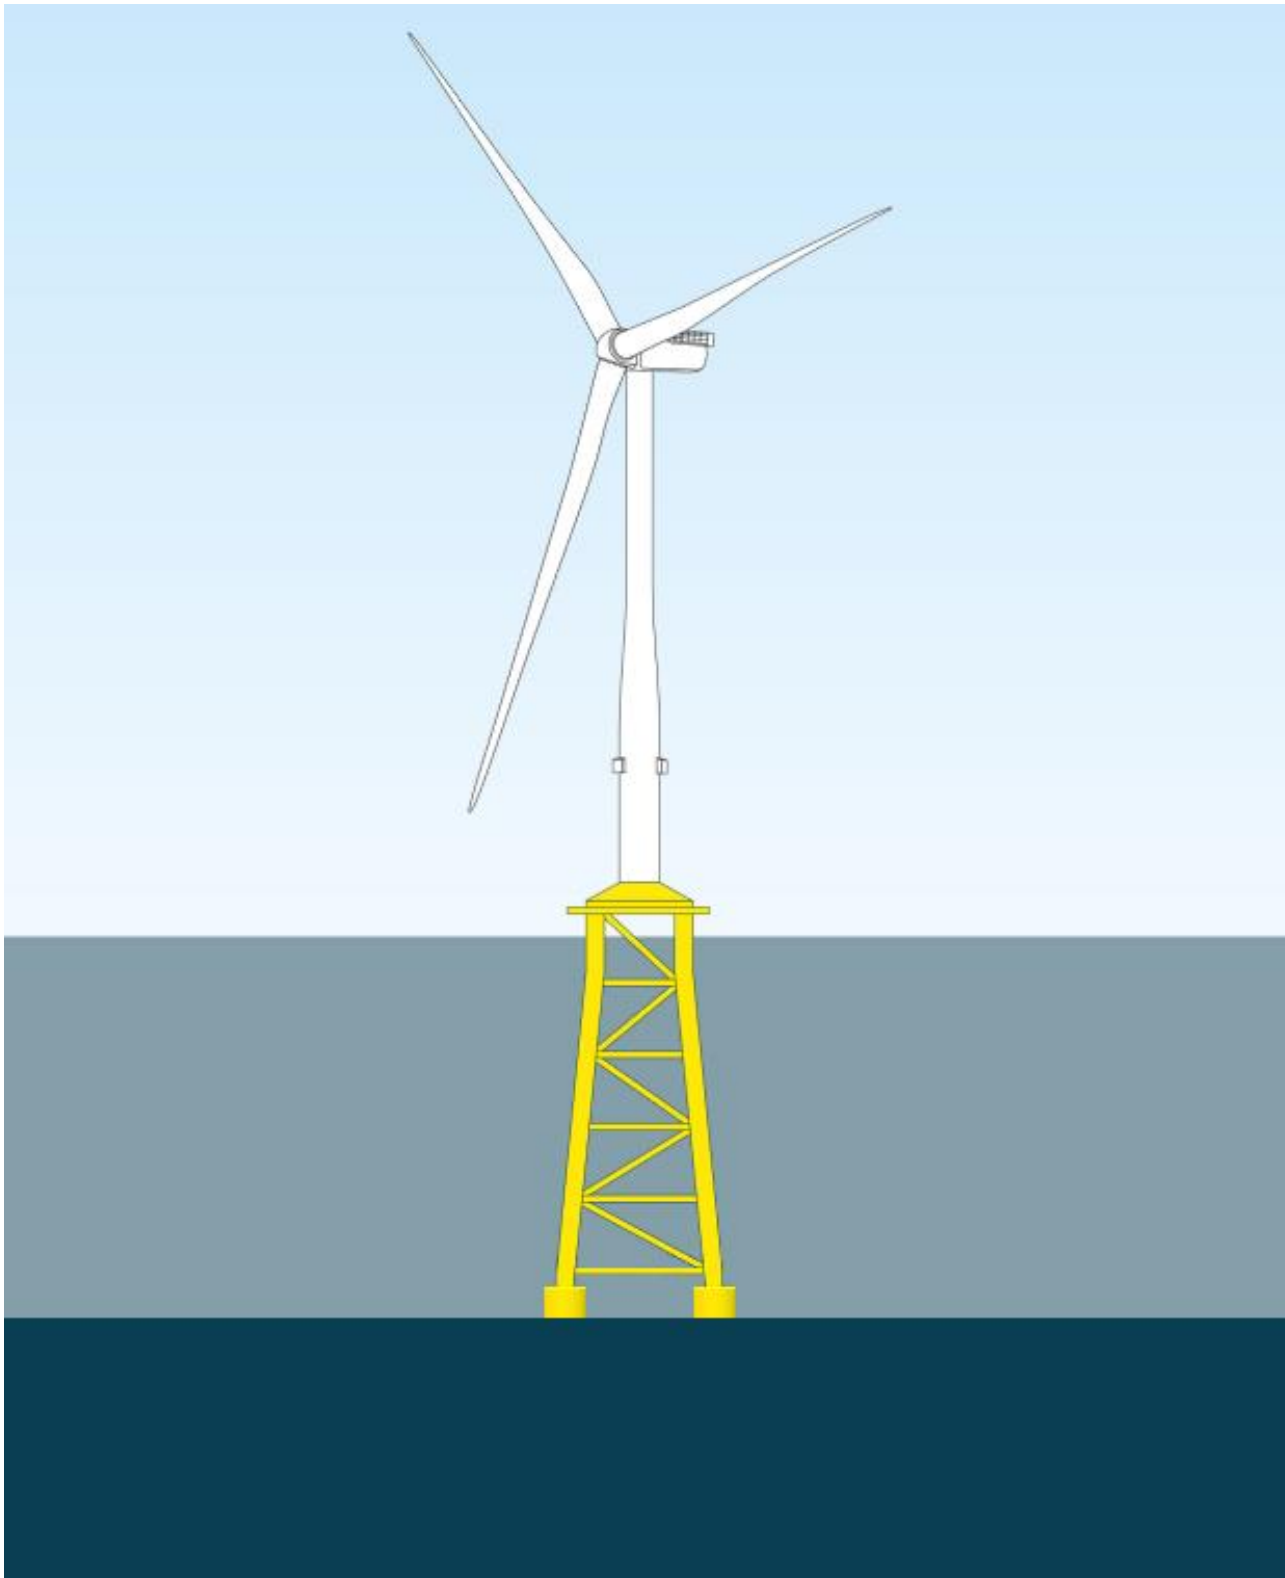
Indicative design of a jacket with suction caissons WTG foundation.
